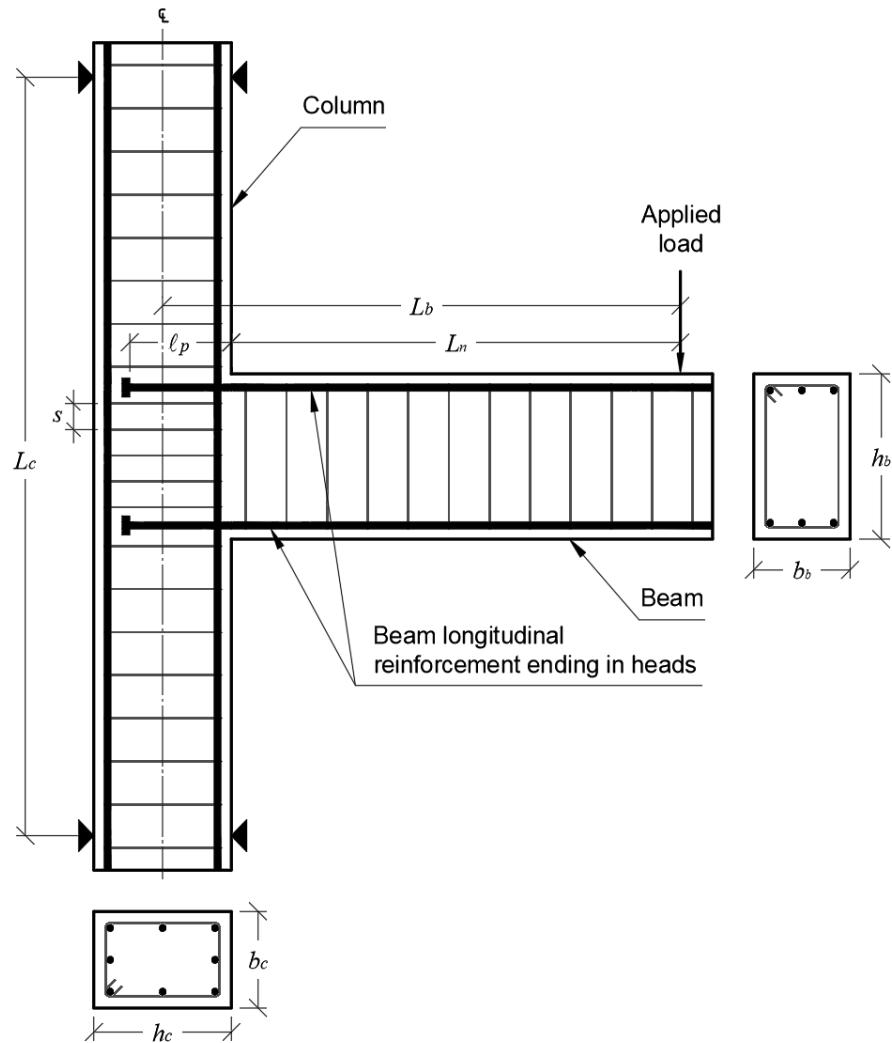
Schematic of specimens in database (elevation and cross-sections)
